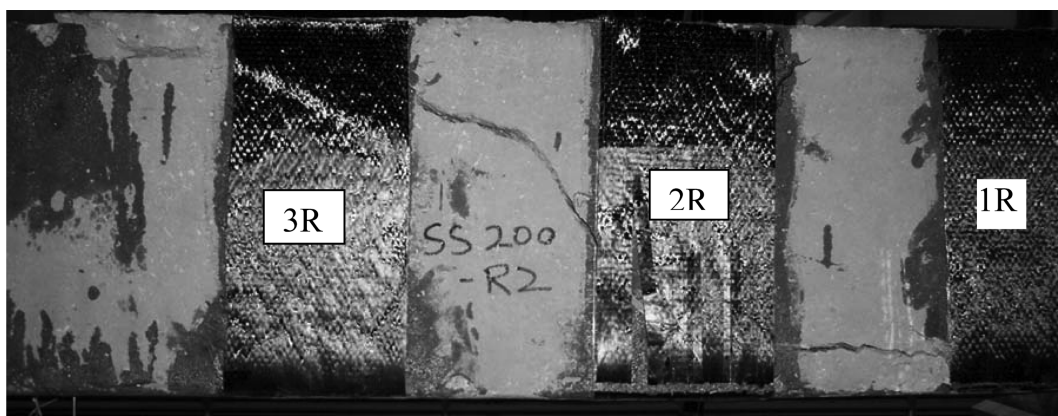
Concrete tensile strain, cracking and failure of strips for SS200
